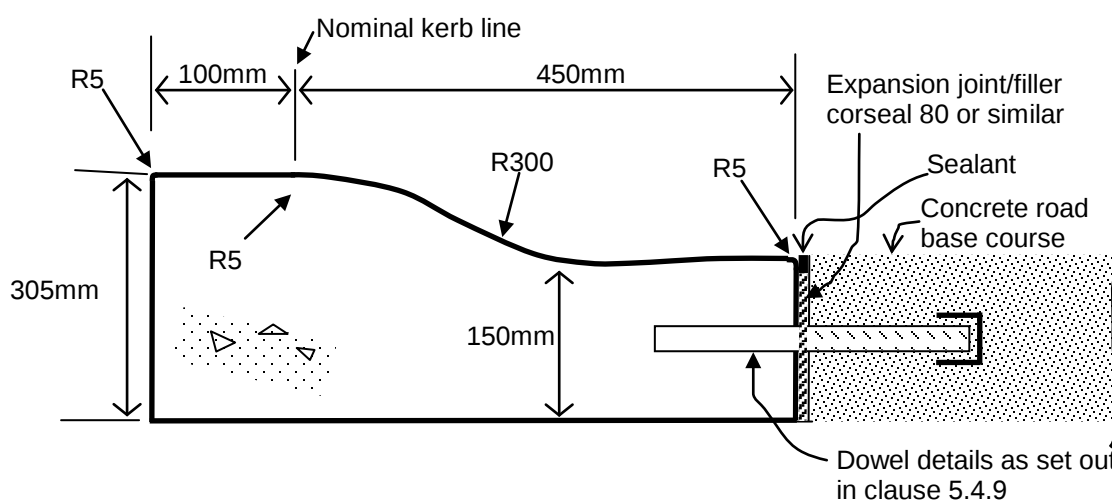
Cross-section of a typical construction of flow-form kerb and gutter style (reinforcing mesh not shown)
